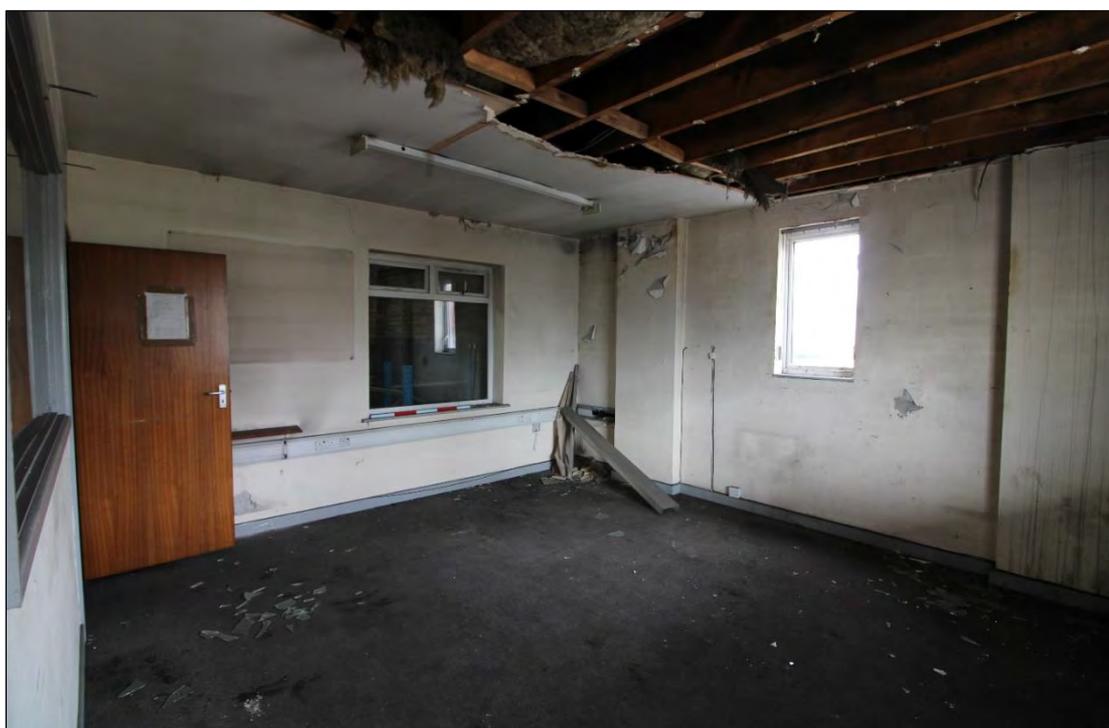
First floor of the two-storey office structure, facing north-west, with 1m scale
